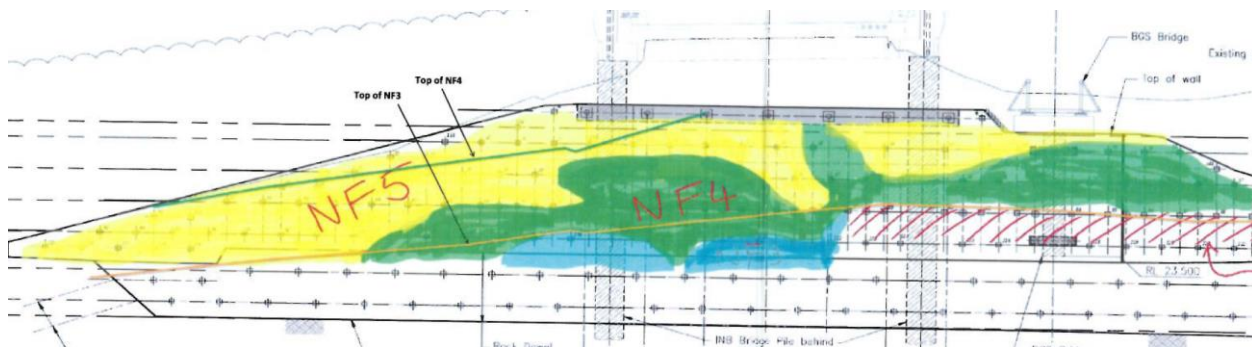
Marked up elevation of soil nail wall showing actual mapped NF unit boundaries (courtesy of Mr Darren Allen)
